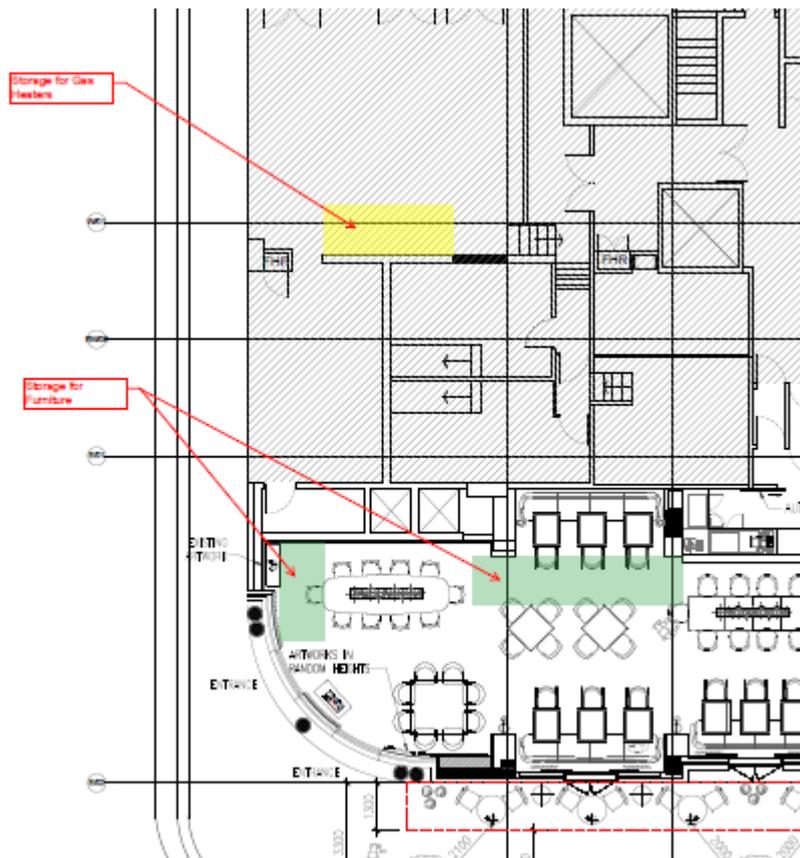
Proposed outdoor furniture storage areas (marked in green and yellow)
